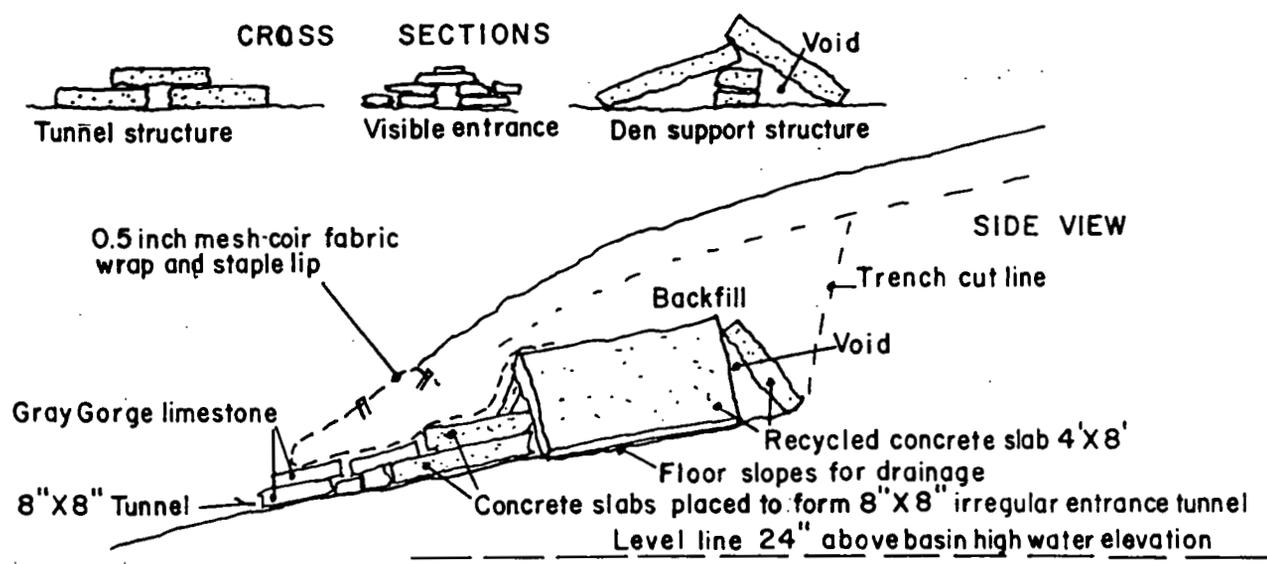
A fox den structure is proposed. The structure is to be made of native stone and concrete paving slabs. The interior of the structure must be sloped to provide good drainage.
